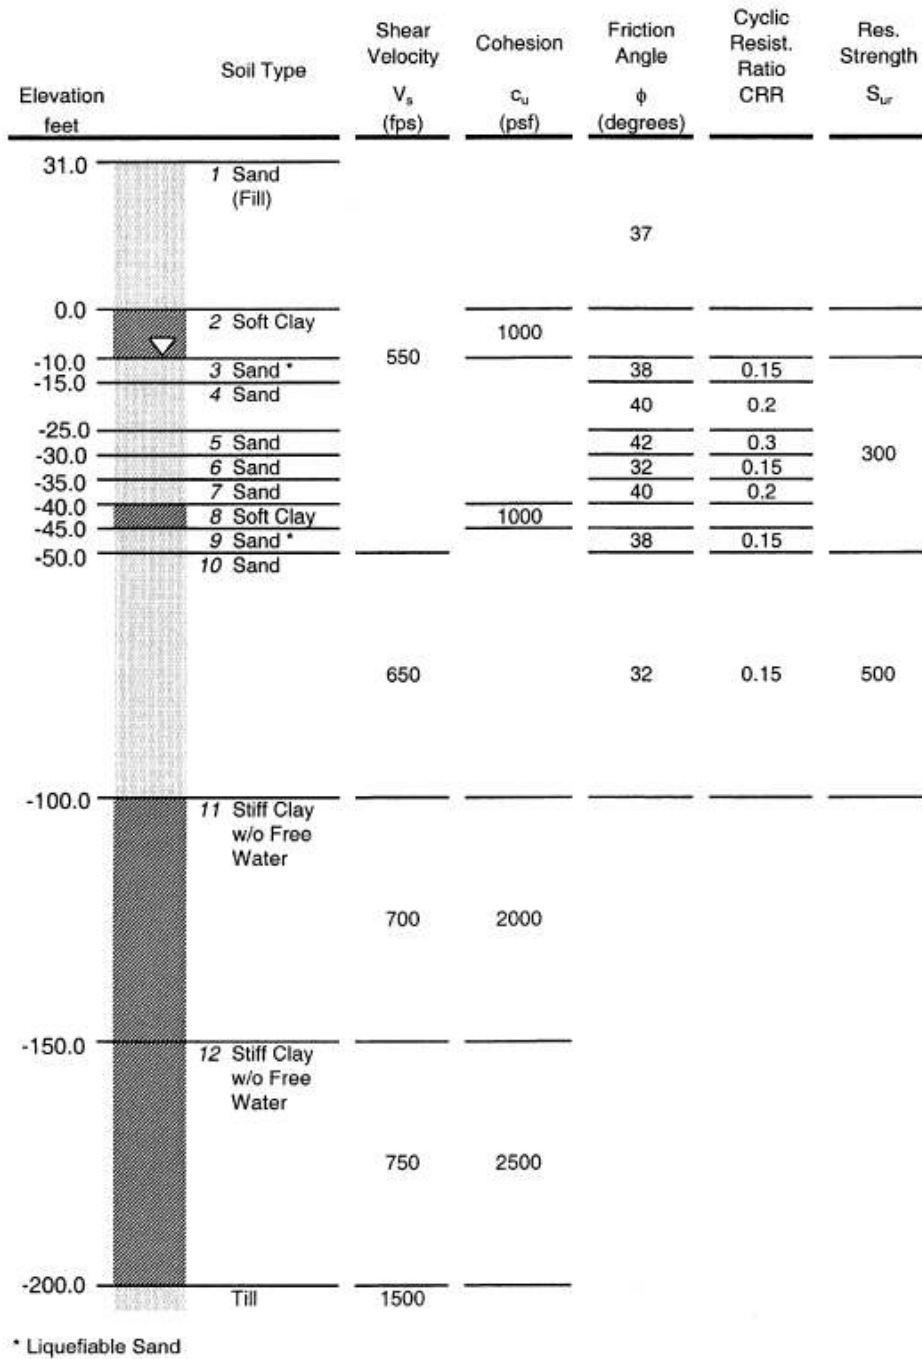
Washington Bridge Site Subsurface Profile (NCHRP, 2003)
